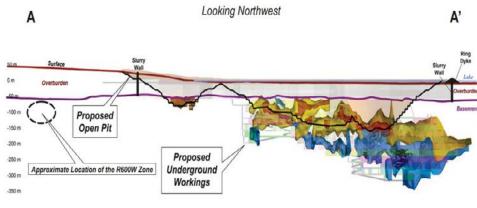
A Cross-Section of the Pit Design for the Patterson Lake Mine (Note that that dewatering the pit will be followed by underground mining). (Ref)
